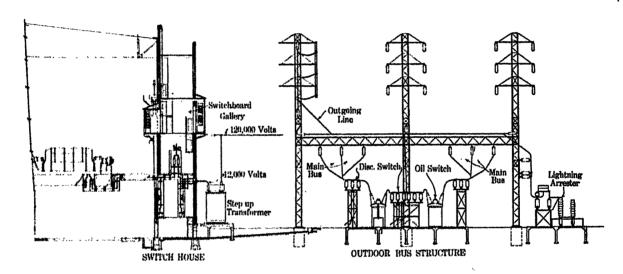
ARRANGEMENT OF ELECTRICAL END OF PLANT
